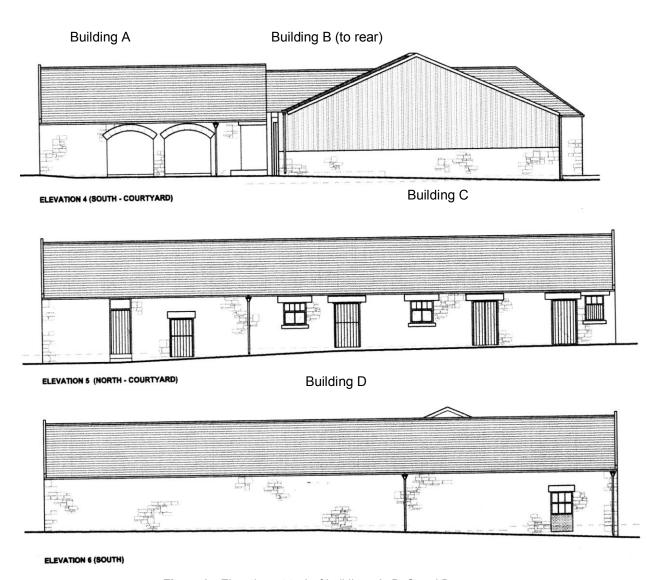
Elevations 4 to 6 of buildings A, B, C and D.
